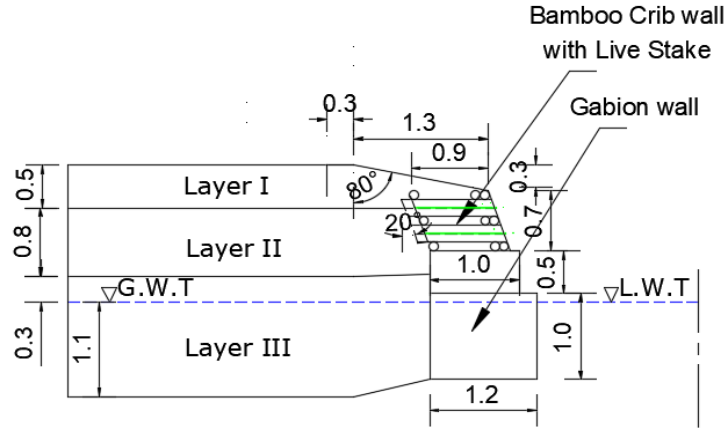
Proposed idealized section of Bamboo Crib wall
